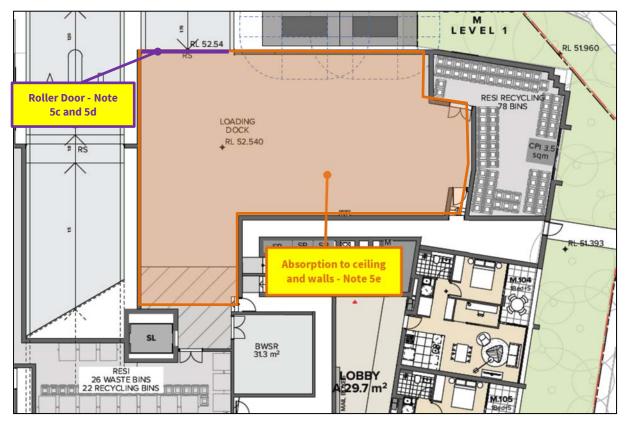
Loading dock was on Level 1 of Building 2C (image source - architectural drawings)
